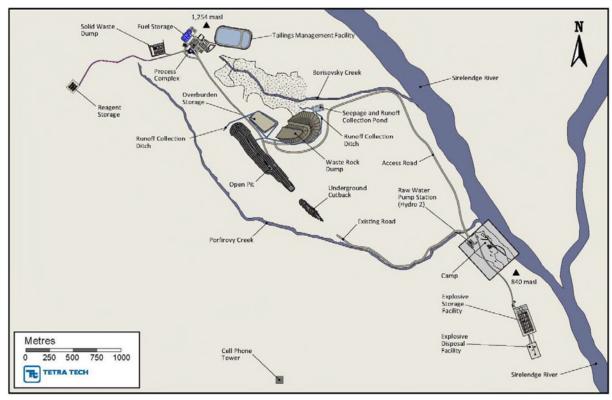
Site Infrastructure Layout (Tetra Tech 2017)
